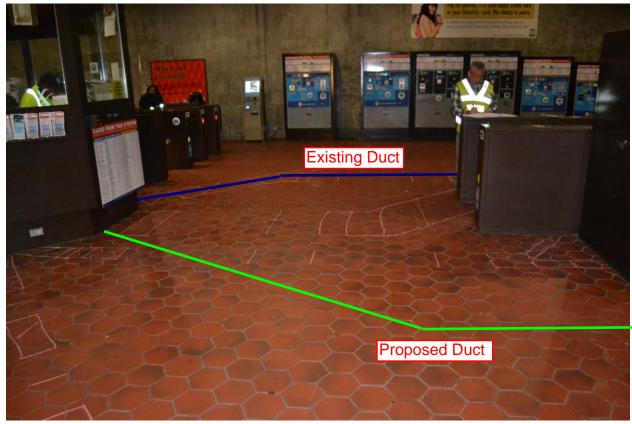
Existing and proposed duct run from Kiosk (Angle 2).
